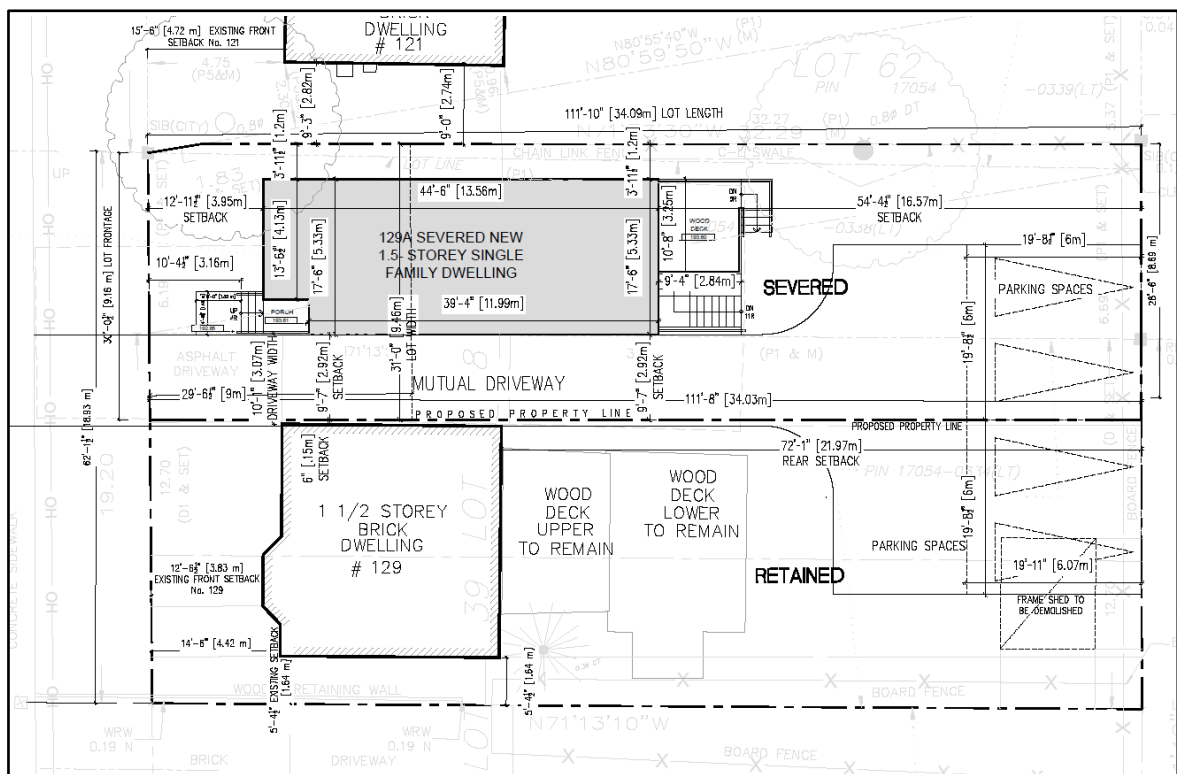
Plan showing the Severed and Retained Lot (Source: Urbanscape Architects, February 22, 2021)
